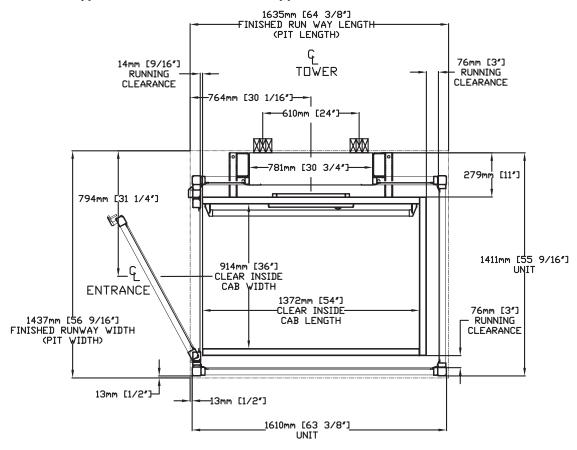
Plan View - Type 1L, 36" x 60" Cab, Hoistway Application
